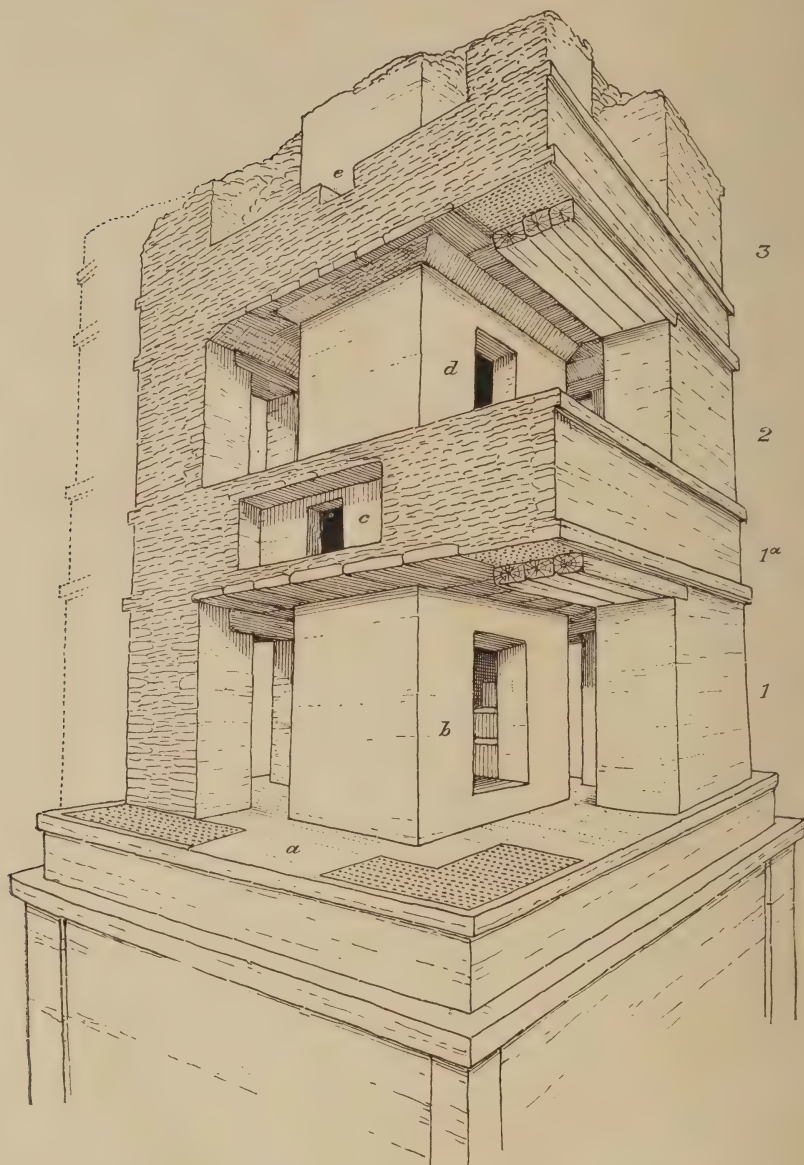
PARTIAL SECTION OF TOWER EXHIBITING VARIOUS FEATURES OF CONSTRUCTION.
